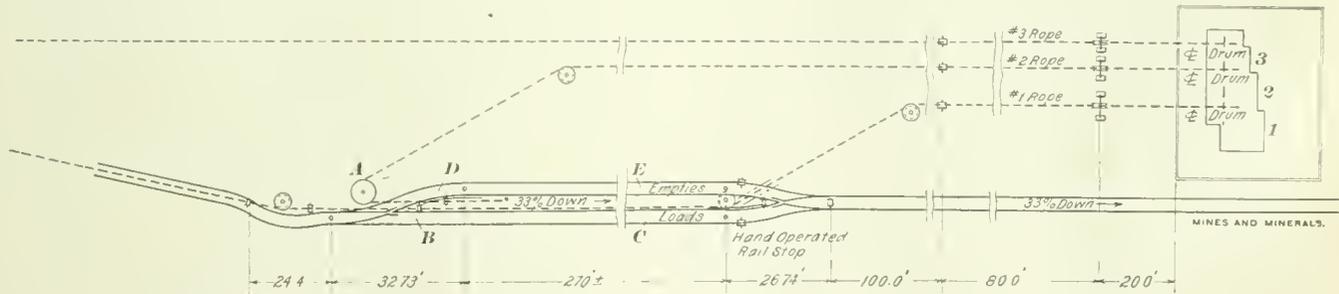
PLAN OF HAULAGE AT GRAY CREEK MINE
